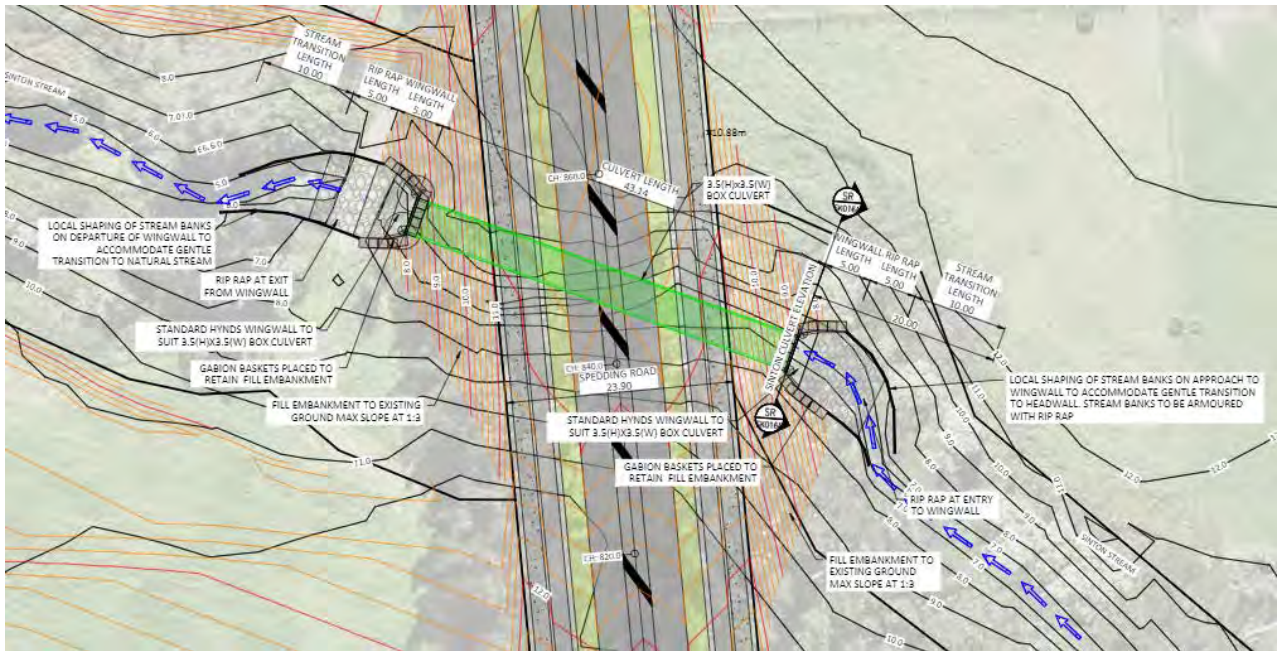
Proposed culvert (refer Crang Civil Drawing SK016 , illustrating future Spedding Road extension. Refer to Appendix 4
